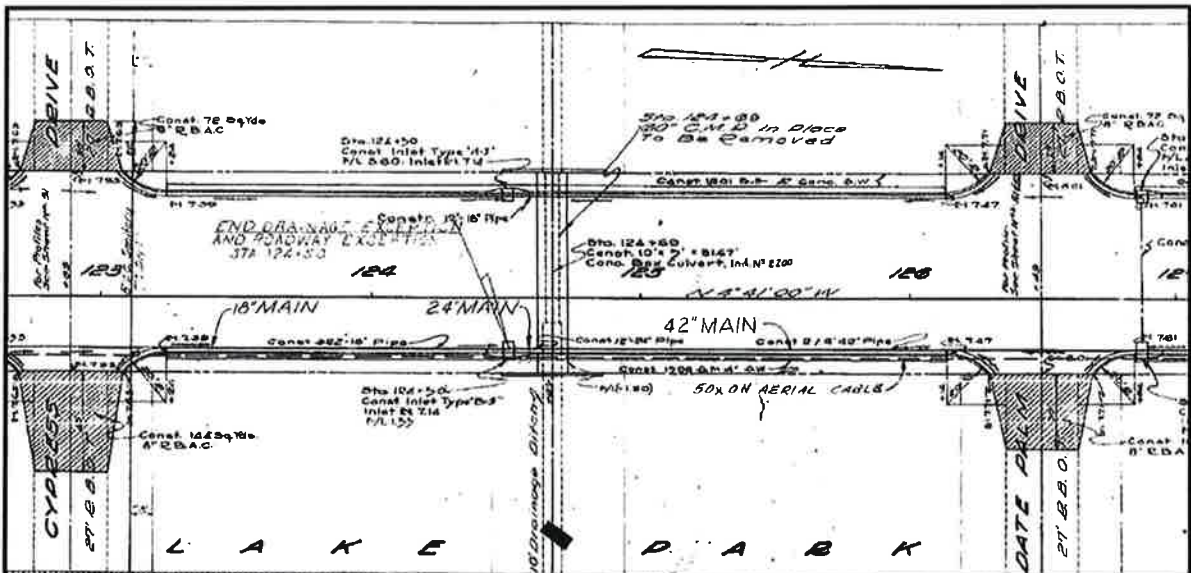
FDOT 1969 Plans for US Highway#1 Drainage Installation along Town of Lake Park
